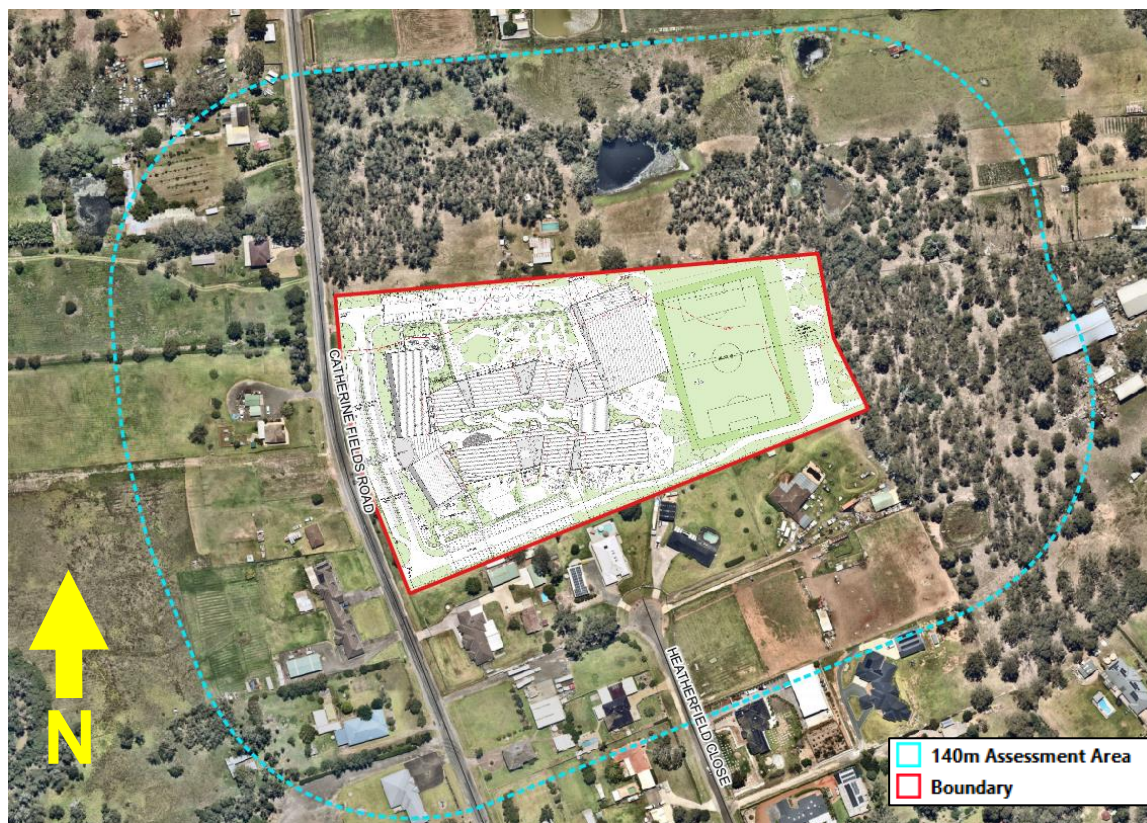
Aerial view of the subject site (thick red outline), site plan and surrounding area
